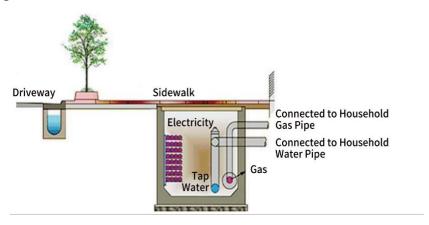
Diagram of Branch Pipe [62]
